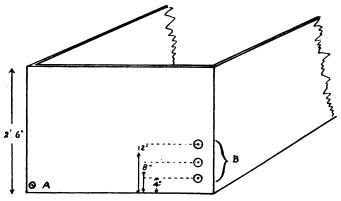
A, Sludge outlet. B, Effluent outlets.
